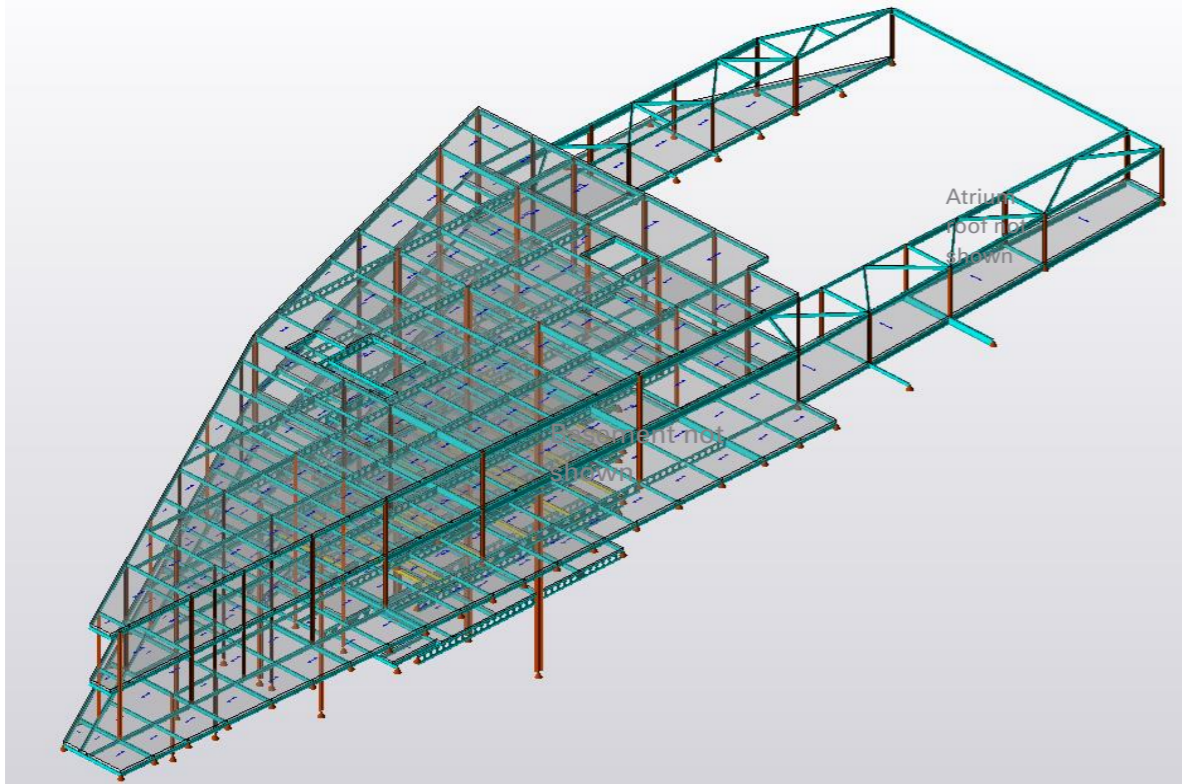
Tekla Structural Designer 3rd floor sub-model of steel frame.
